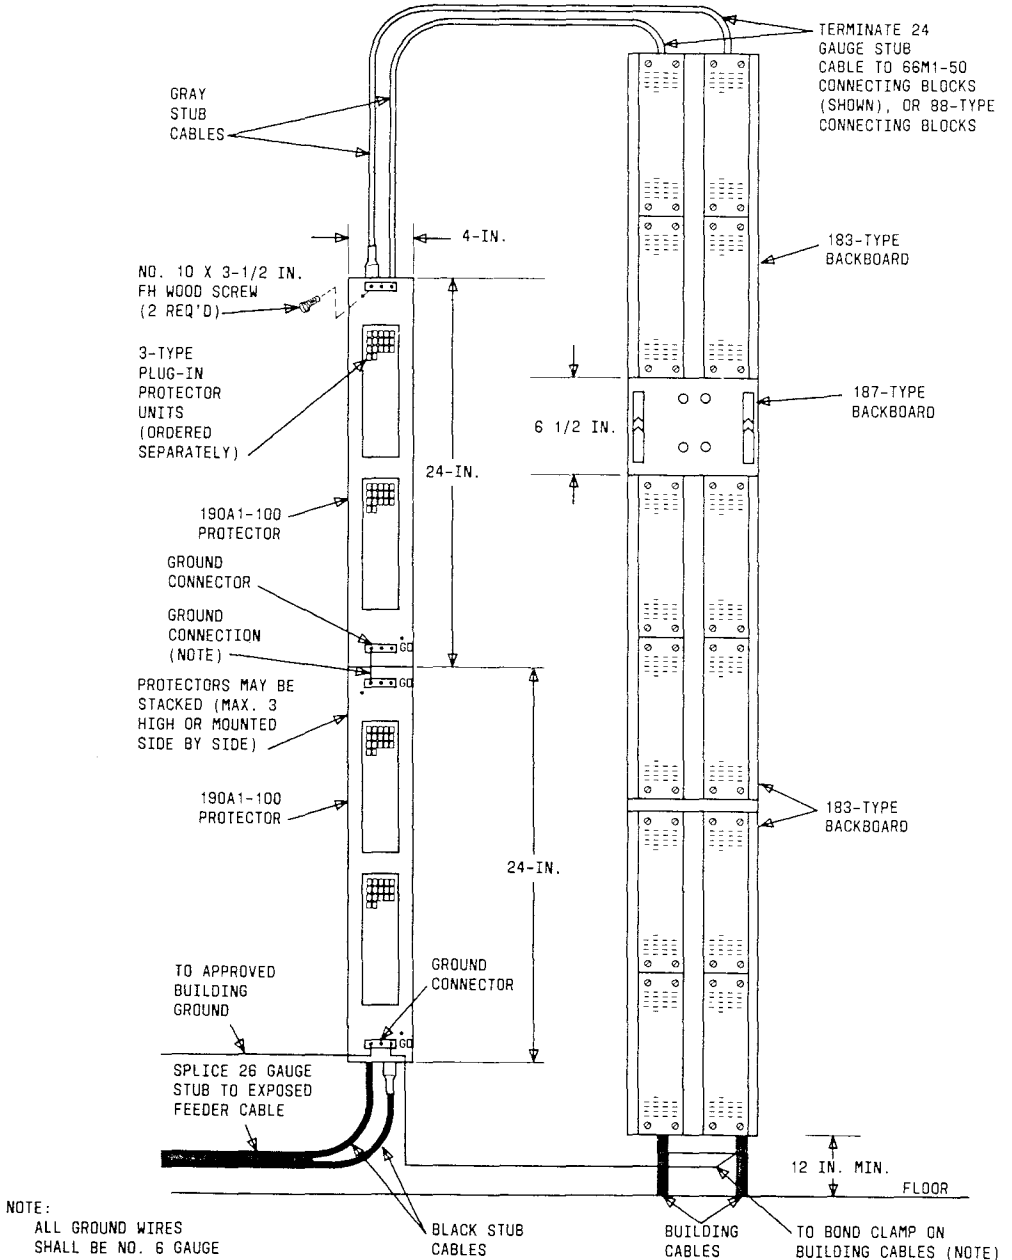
Wall Mounted Protectors—200-Pair Exposed Entrance Cable—Typical Installation
